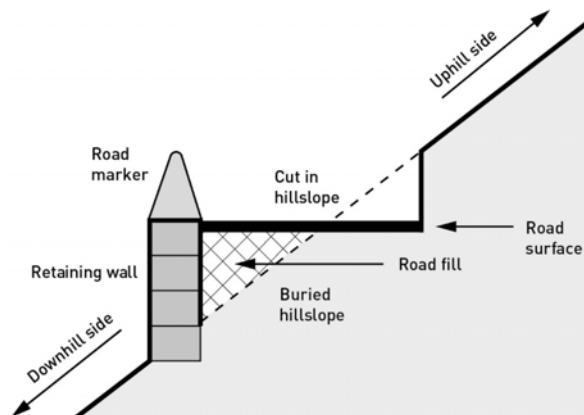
Schematic cross section of an ancient road explaining terminology used in the text (drawing by Bert Brouwenstijn/Stefan Kooi).
